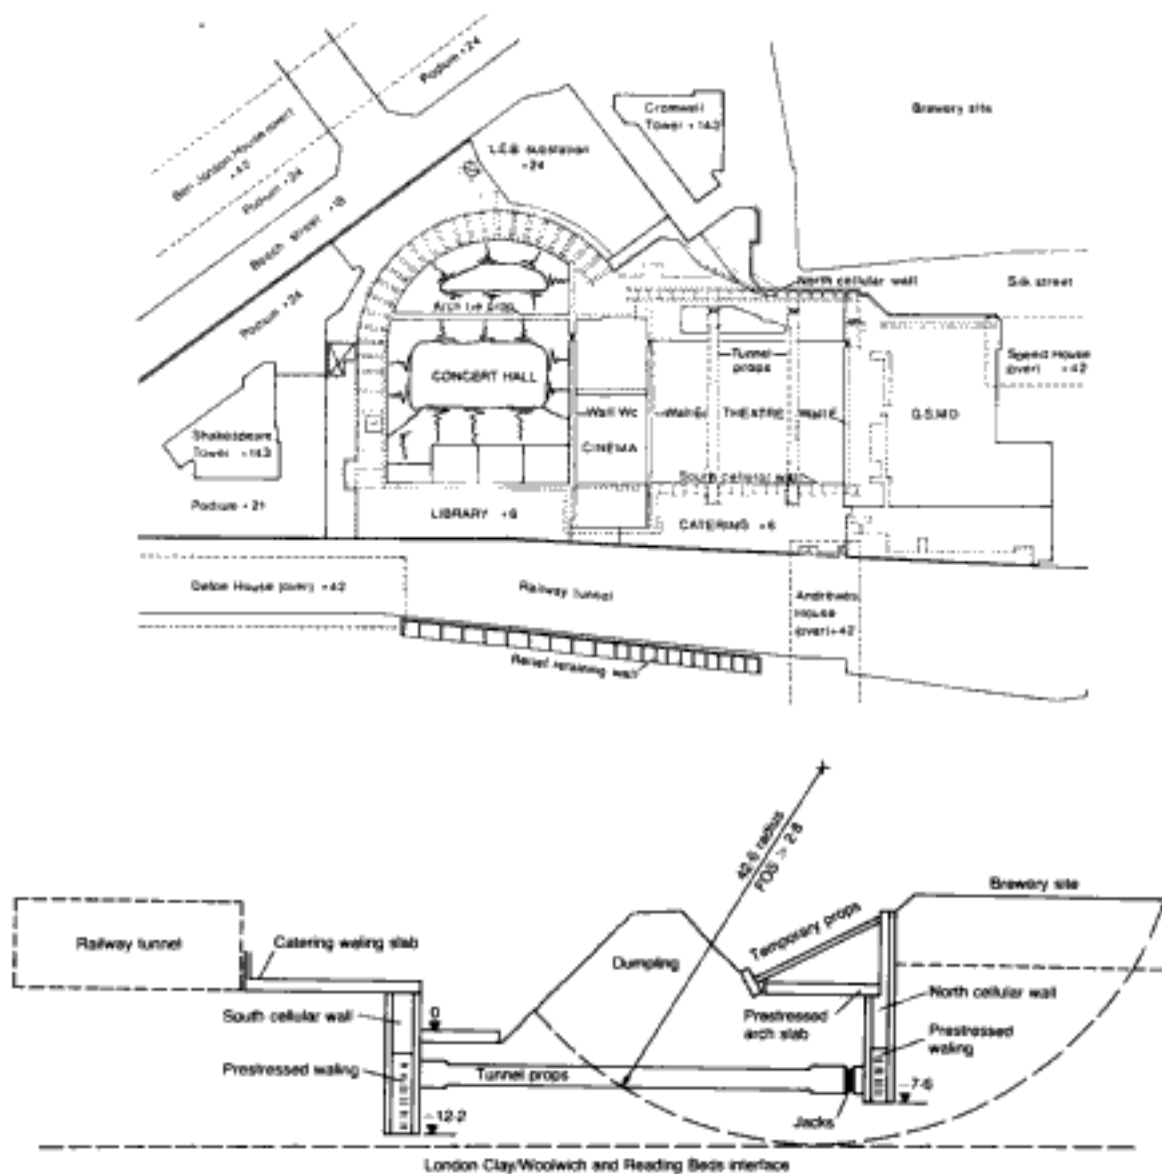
Barbican Arts Centre: site plan and cross-section of site during excavation showing use of preloaded tunnel props (Stevens et al.¹⁴)
